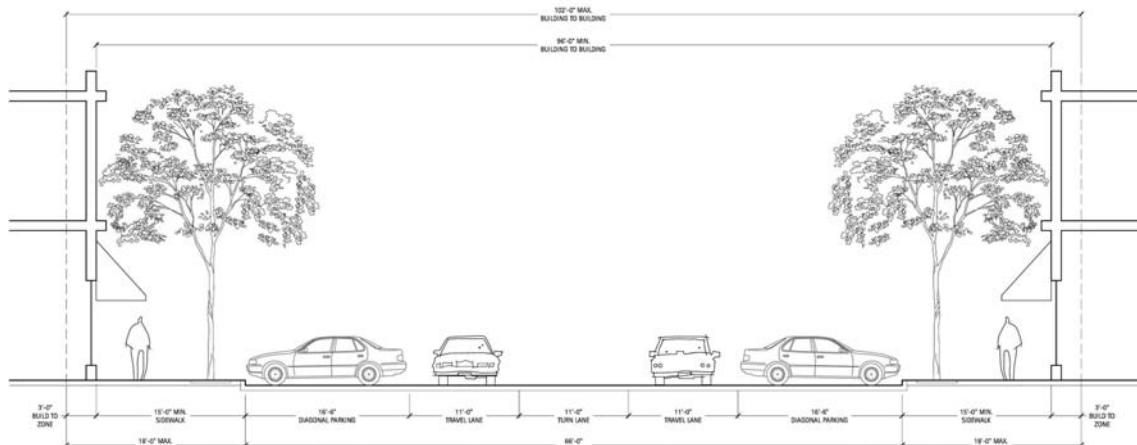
Section of Typical Toft Avenue Roadway Section in TC District
